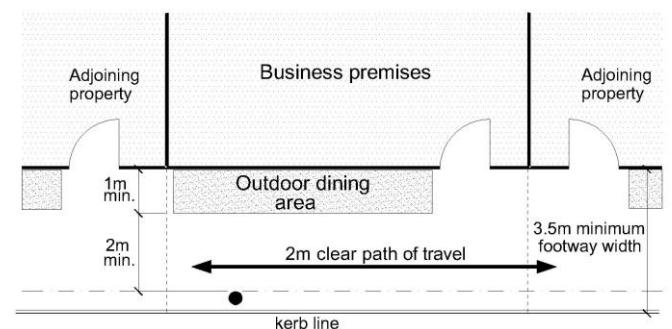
; general layout for Outdoor dining areas located adjacent to the shop front
